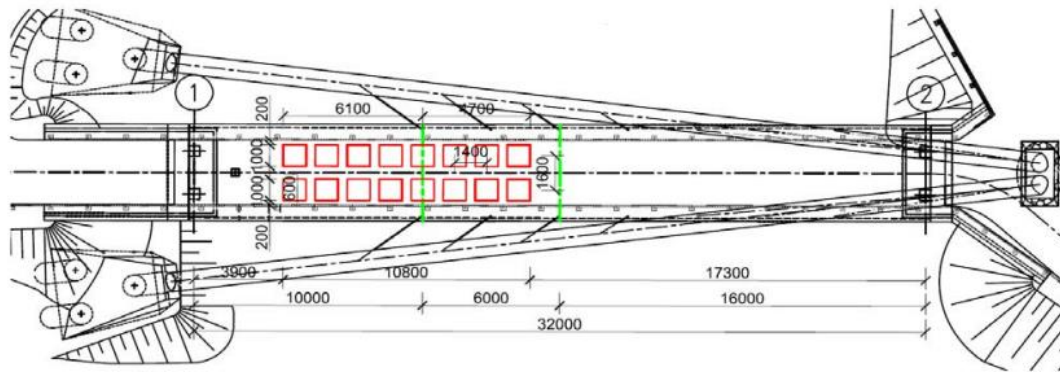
Plan view highlighting in green section 1-1 and 3-3
